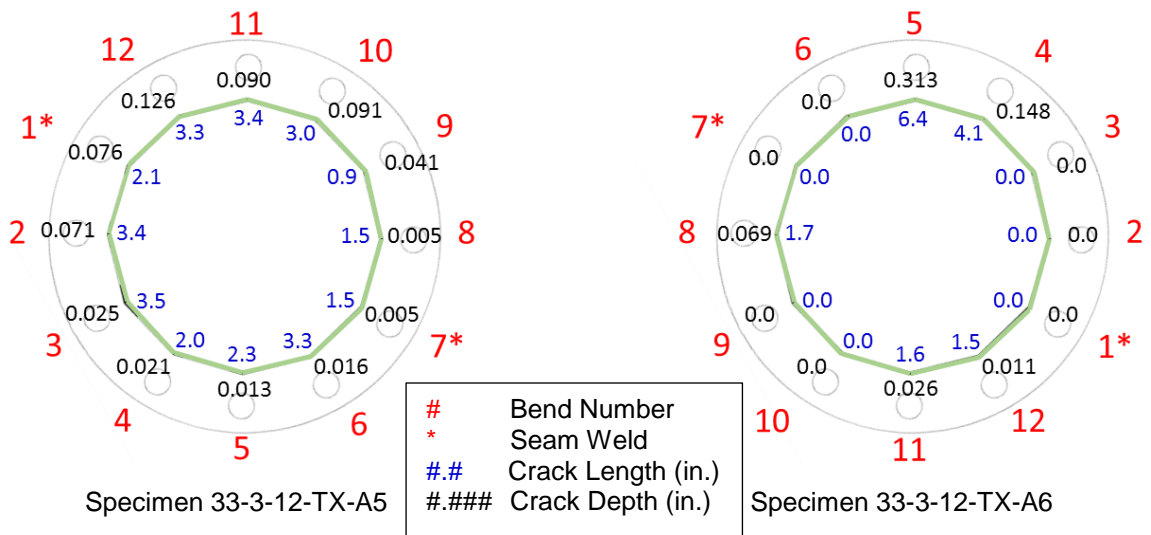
Specimens 33-3-12-TX-A5 and 33-3-12-TX-A6: Cracks after 148.9 Million Fatigue Cycles
